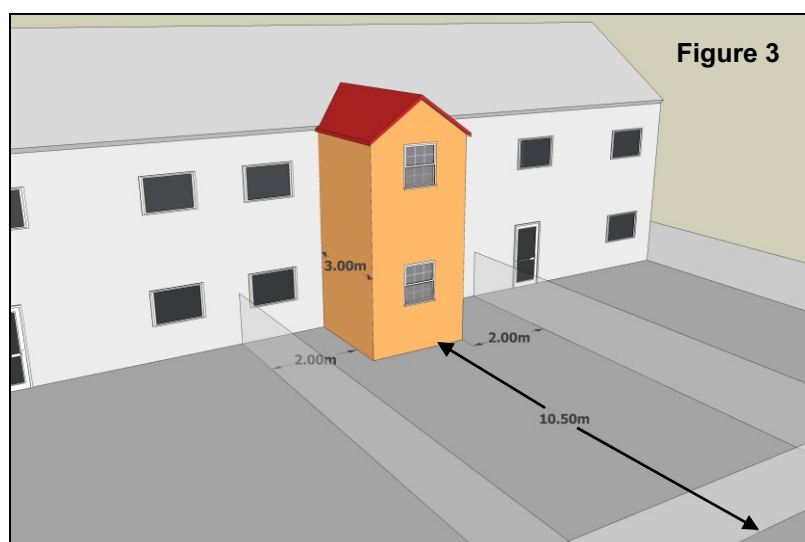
shows an example of a 2 storey extension that would meet all the above conditions
